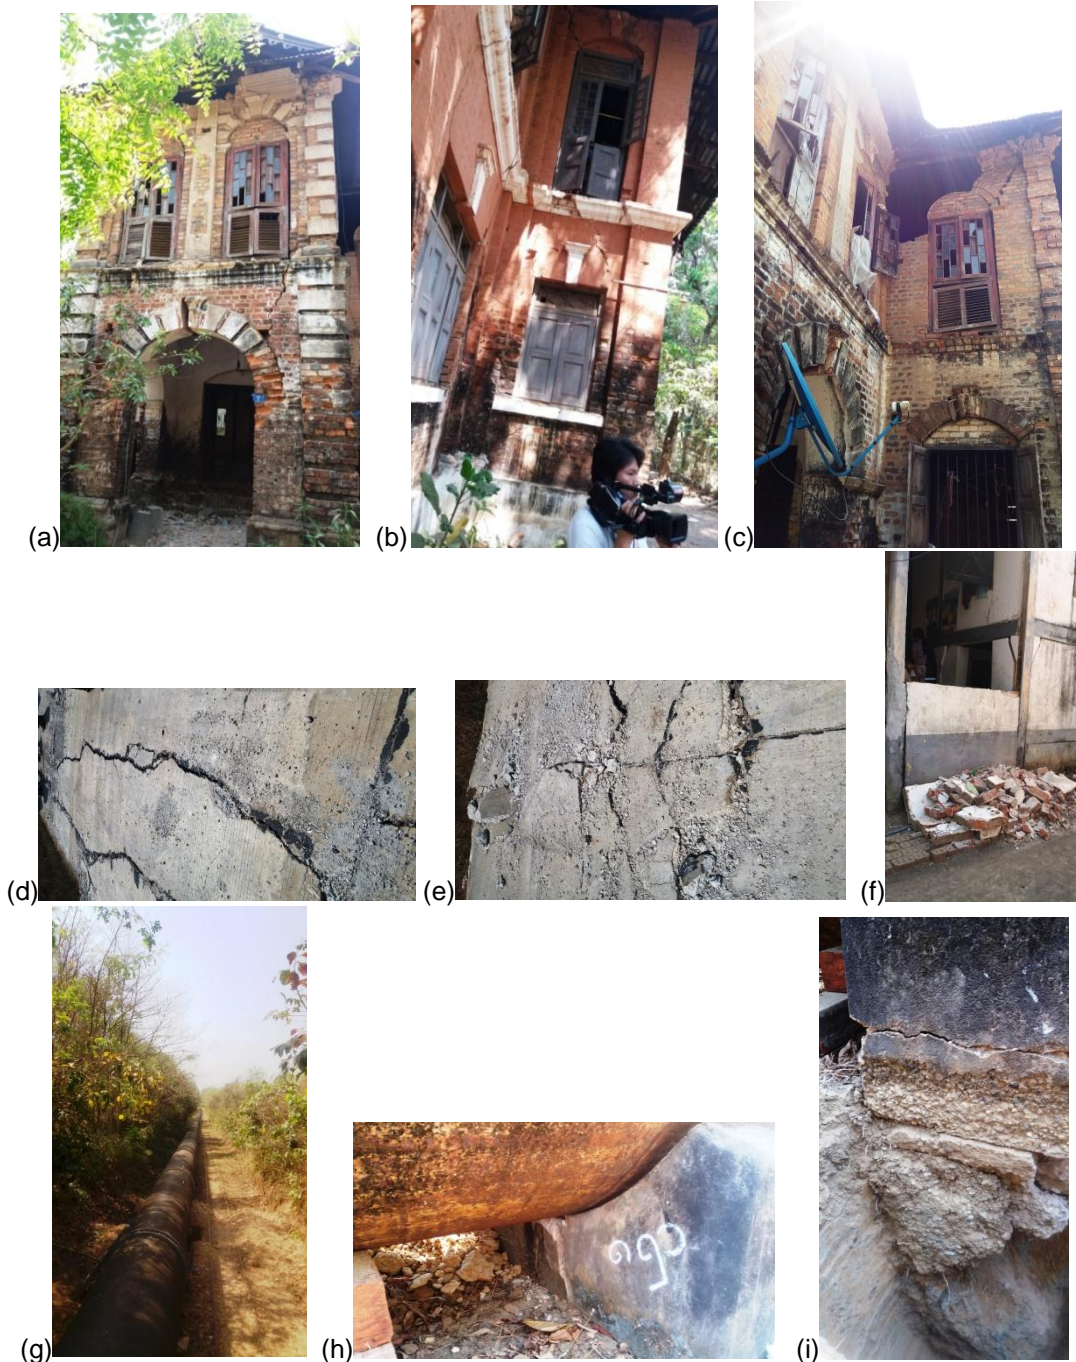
(a,b,c) Photos of damage to a building in which upper floor was fallen to the ground due to Taikkyi earthquake. (d,e) damage to the pavement of the road in Taikkyi. (f) Damage to the wall of a building. (g,h,i) Damages at the base of Gyophyu pipeline
